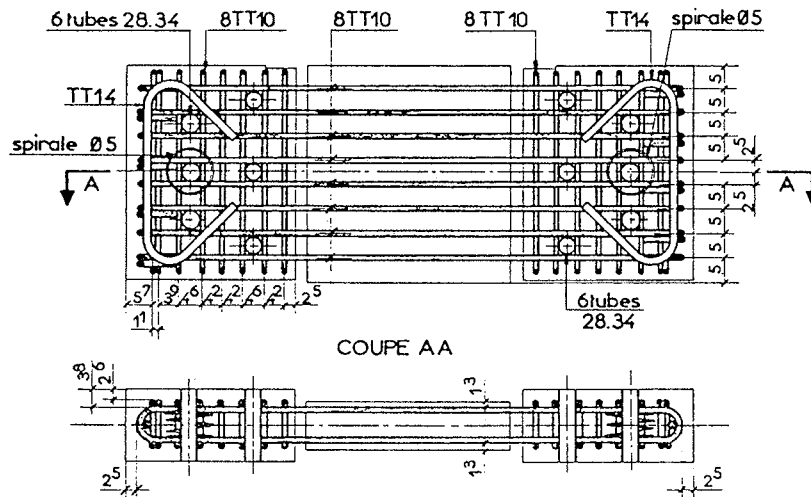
Reinforcement lay-out of the specimens [69,1]
